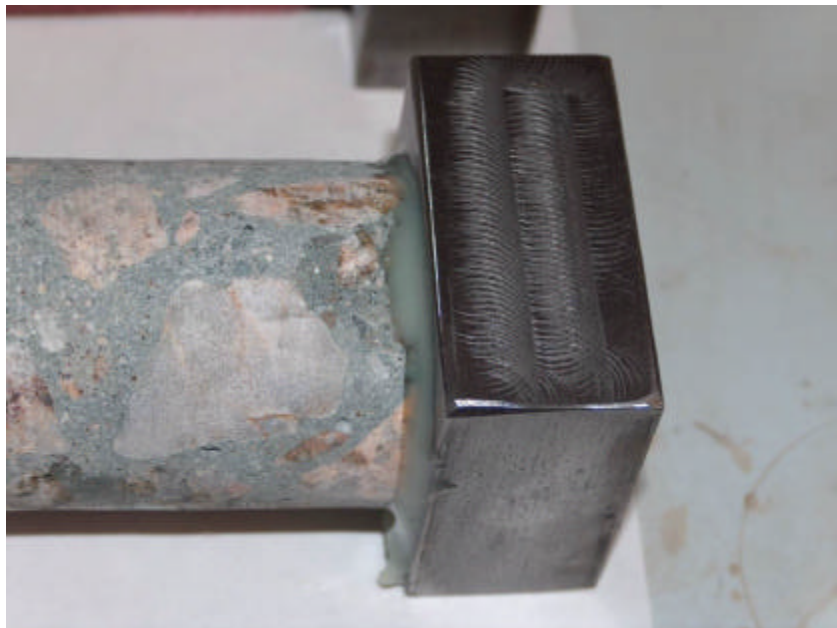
Preliminary Specimen with Closeup of Epoxy Bond
